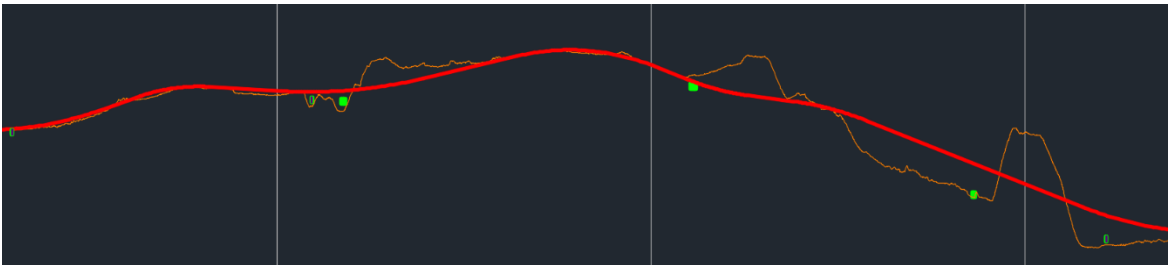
Roadway profile of the new alignment showing cut and fill sections
